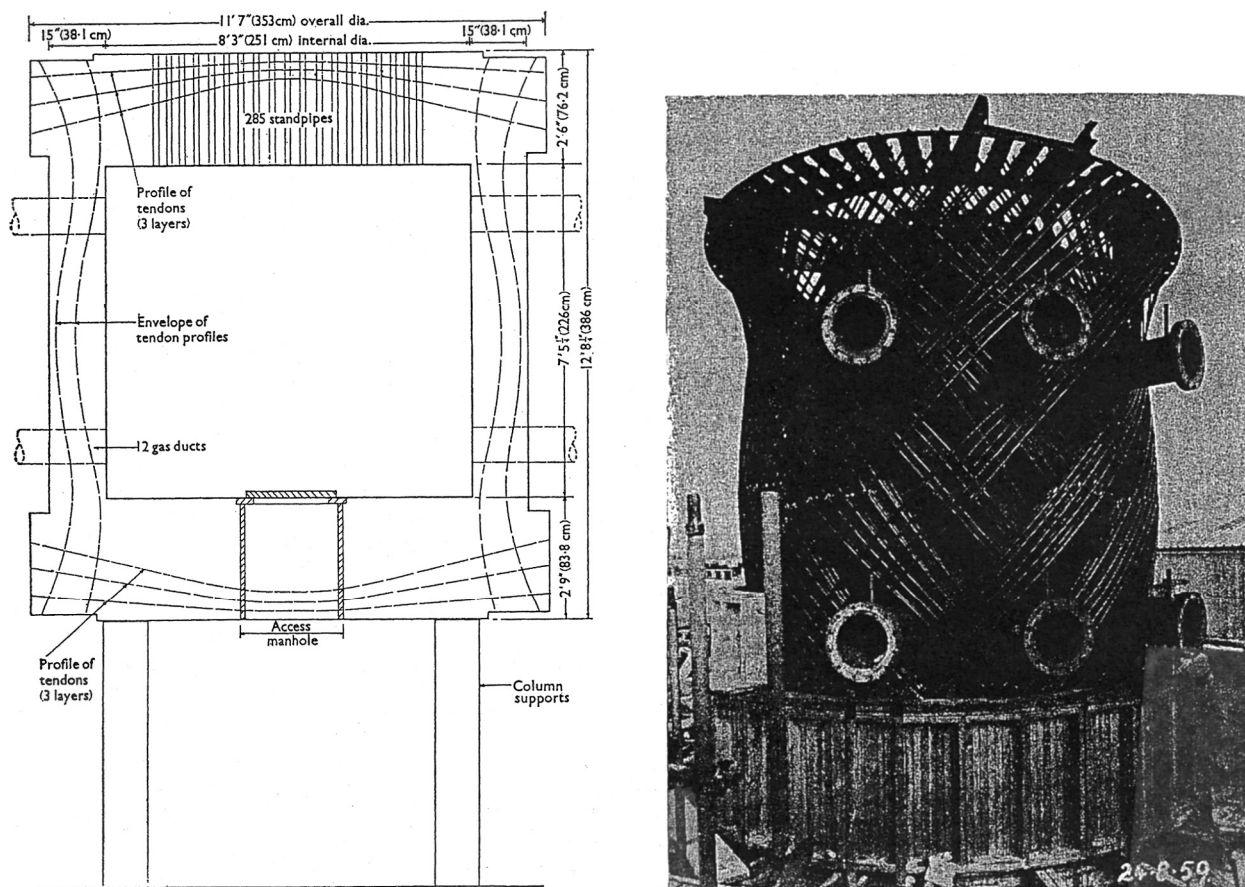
1:8-scale cylindrical PCRV model. Source: D. C. Price and M. S. Hinley, “Testing a 1/8th Scale Cylindrical Vessel,” Group G, Paper 43, *Prestressed Concrete Pressure Vessels*, Institution of Civil Engineers, London, pp. 489–496, 1968.
